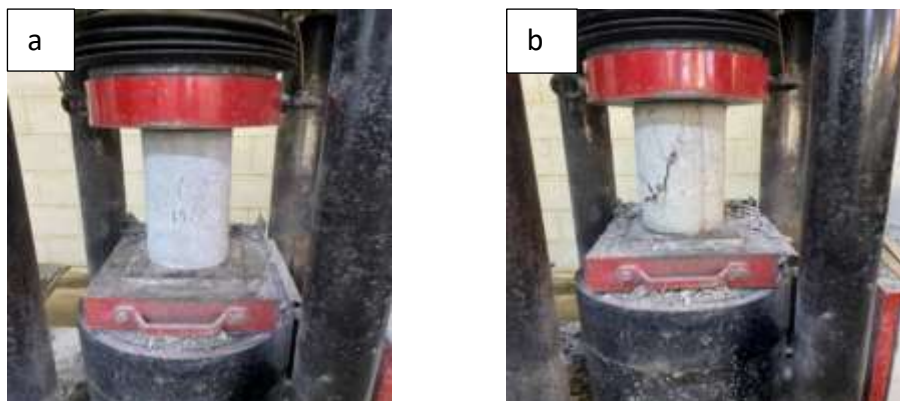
(a) RCCP specimen in the test machine, (b) RCCP specimen after the test.
